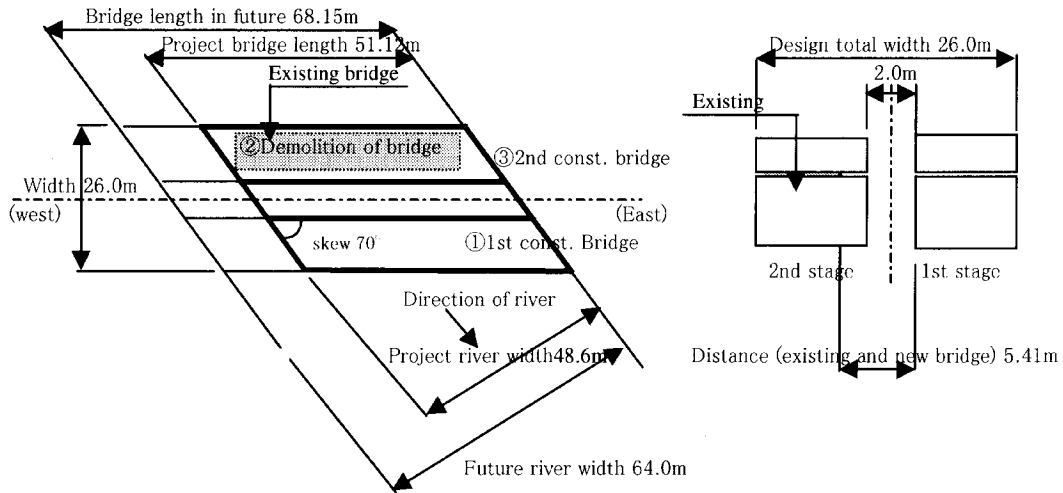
Relationship between Bridge Length and Design River Section
